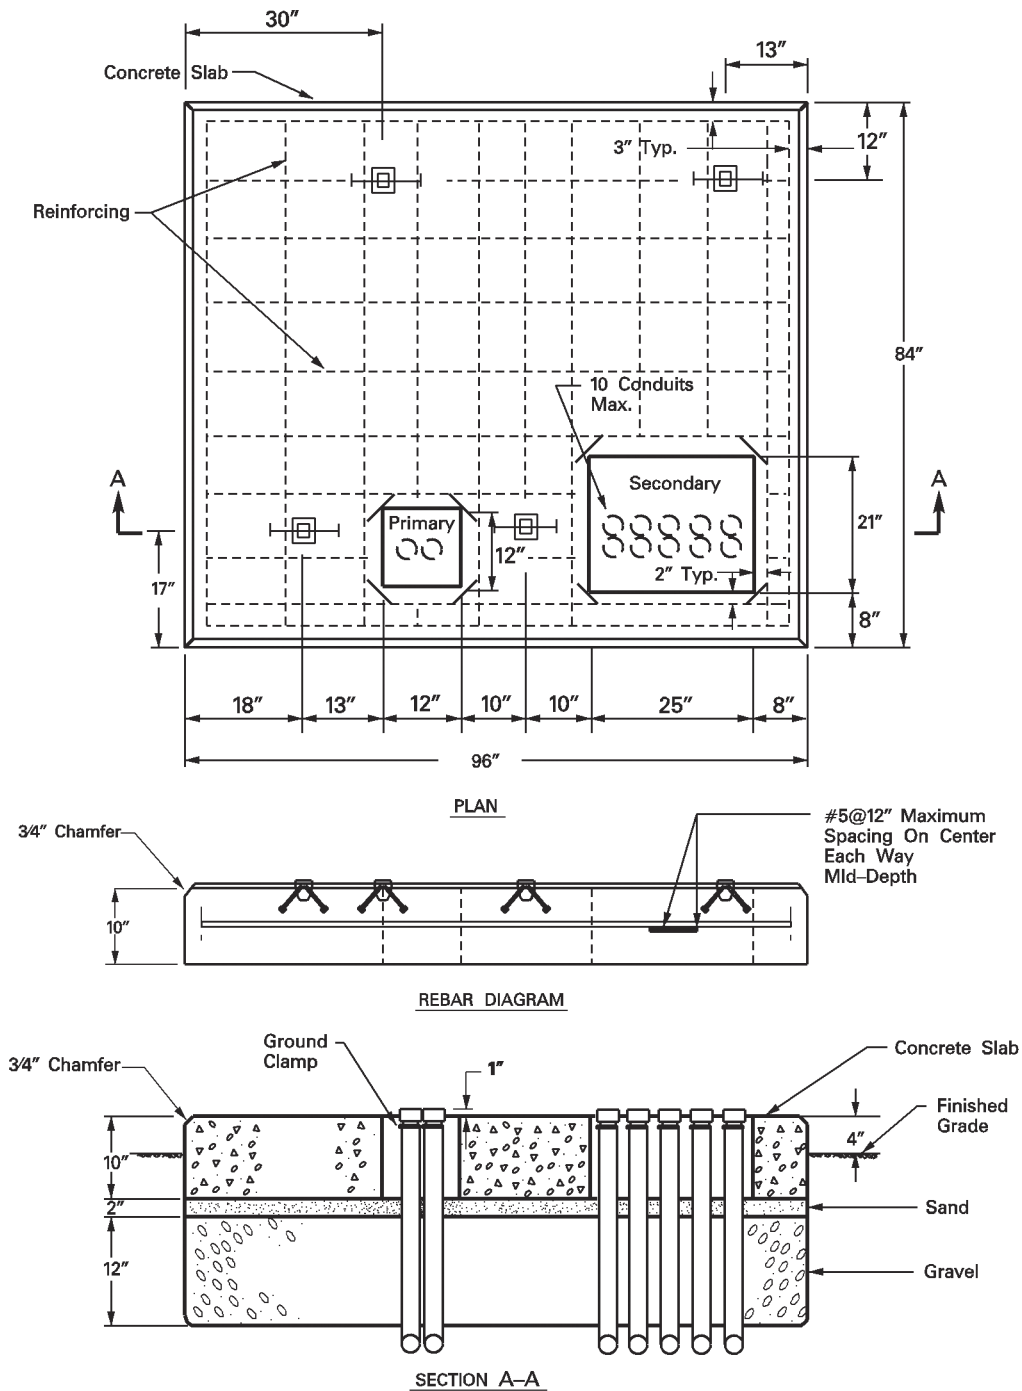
15kV Transformer Pad 750- 2500kVA 44-114 (ref-44-114/UF8B)
